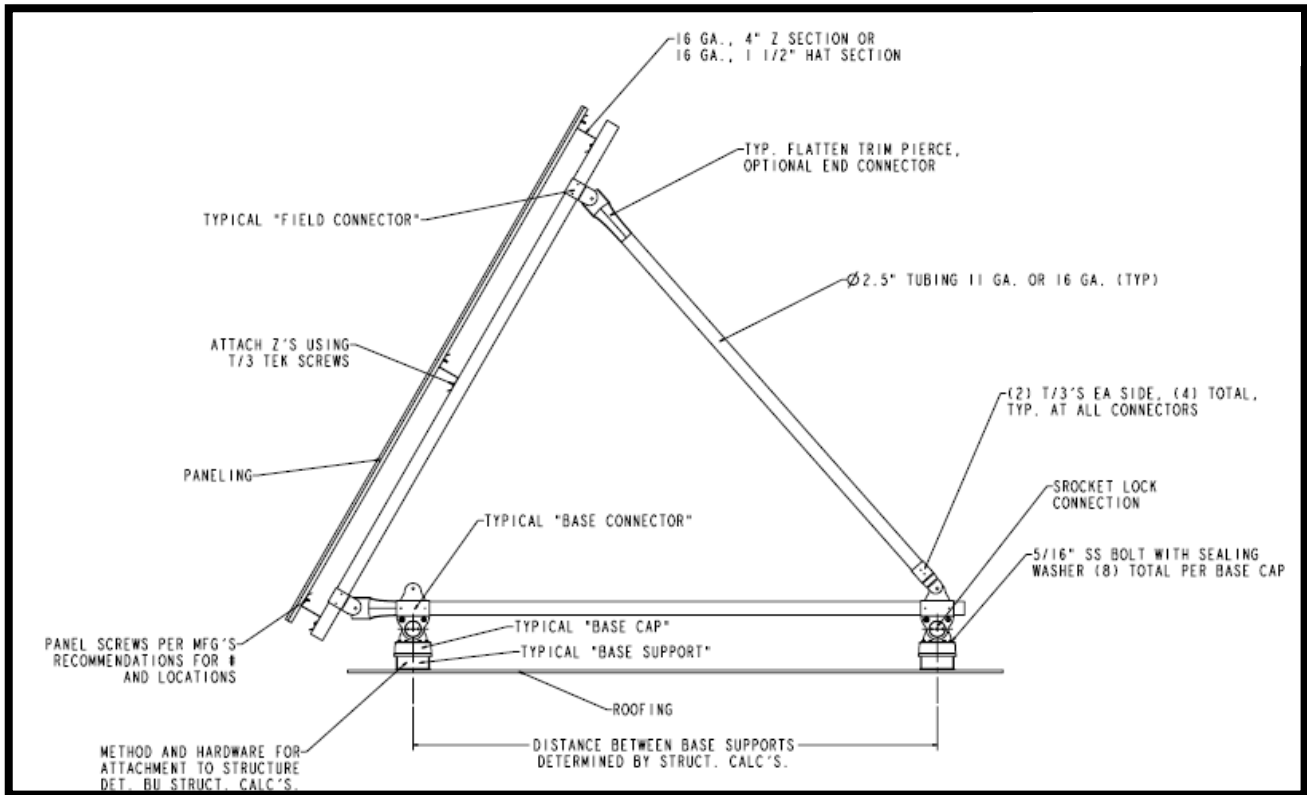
SILVERBACK SOLAR SLOPED FRAME SYSTEM
